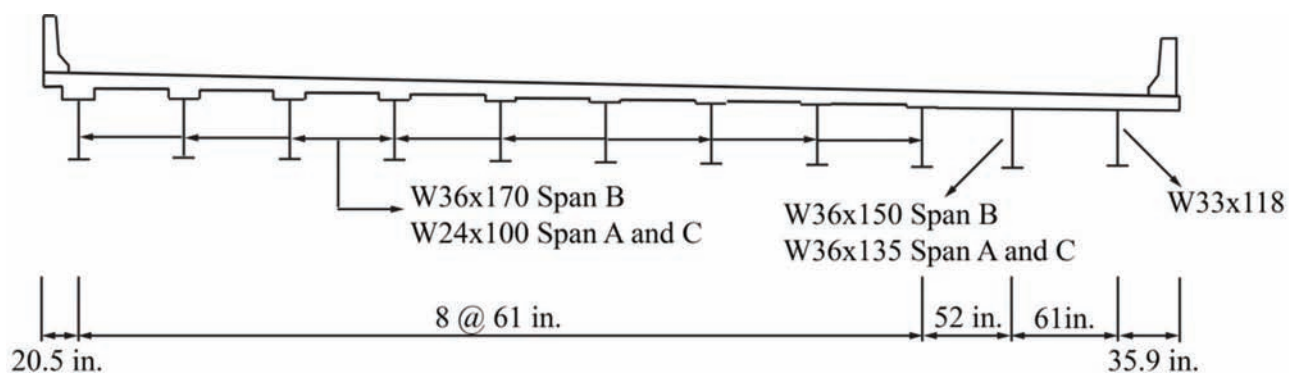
Cross-section of Asset 020-71-04052 (after reconstruction).
